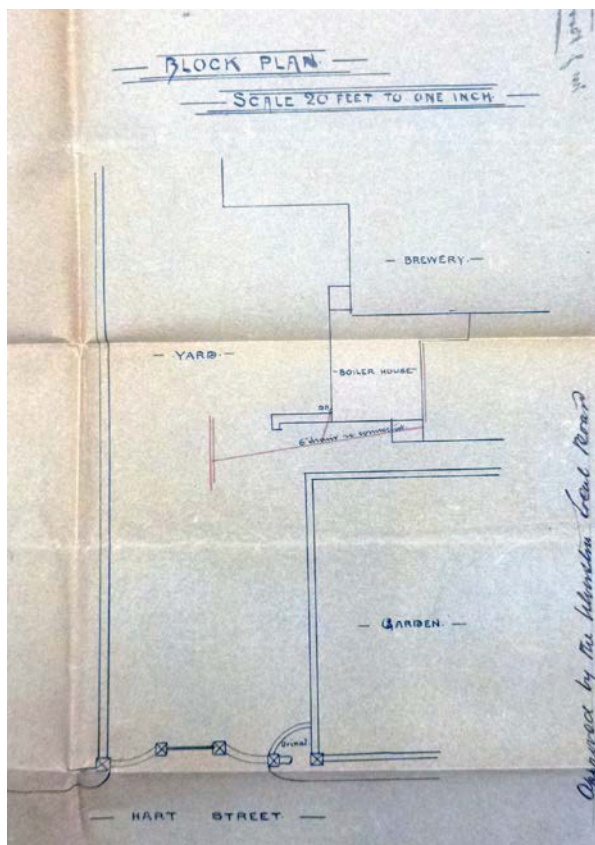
(left): Block plan for New Boiler House and Chimney Stack, 1882
